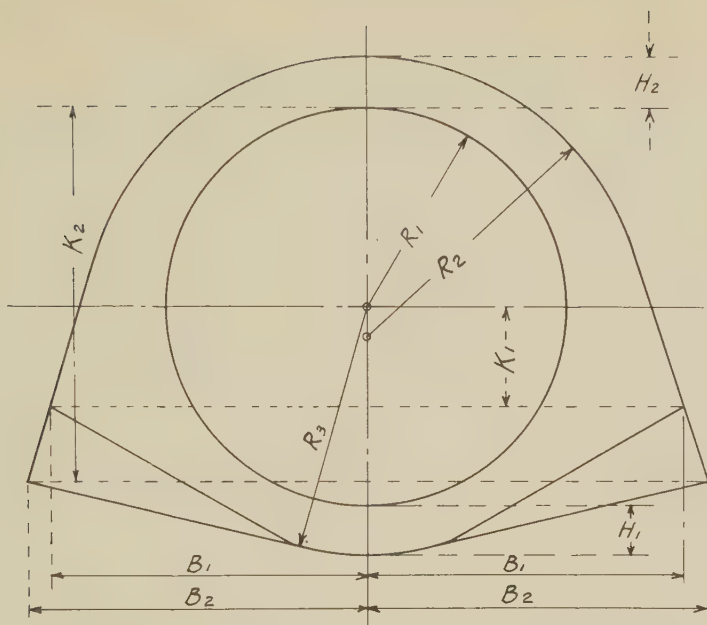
LOUISVILLE STANDARD CONCRETE SECTION.
